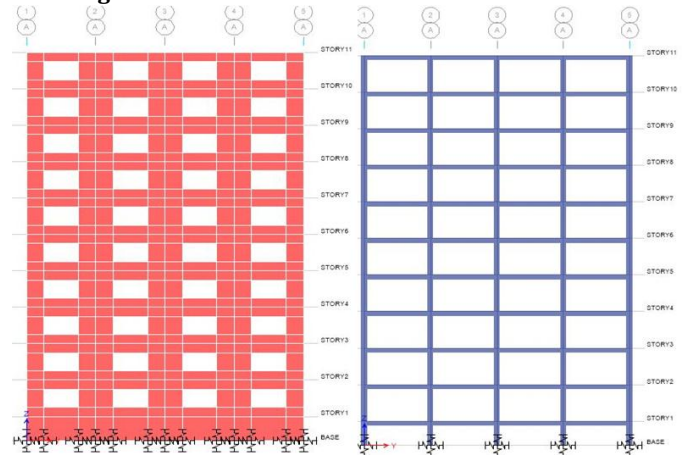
Mivan & Conventional Structural Elevation.
